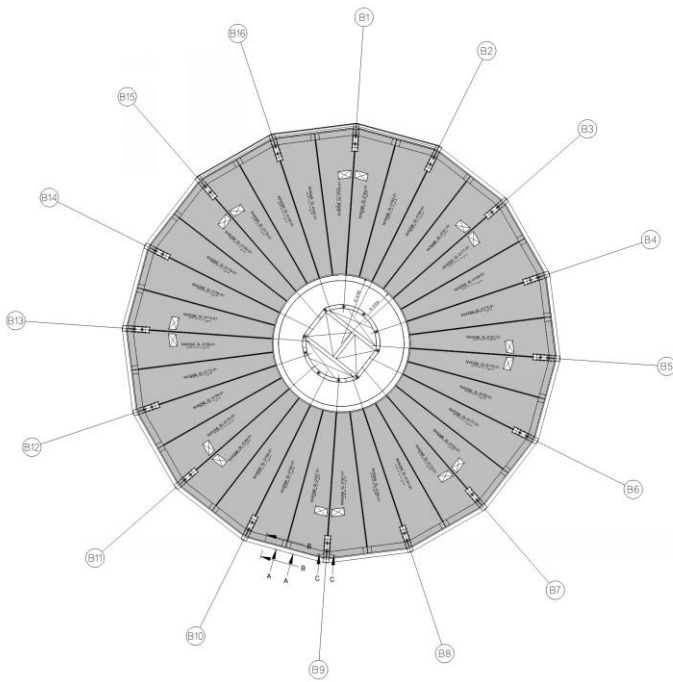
A Place To – Typical Floors of SL-slabs and steel corbel connection © Abeo / A Place To
